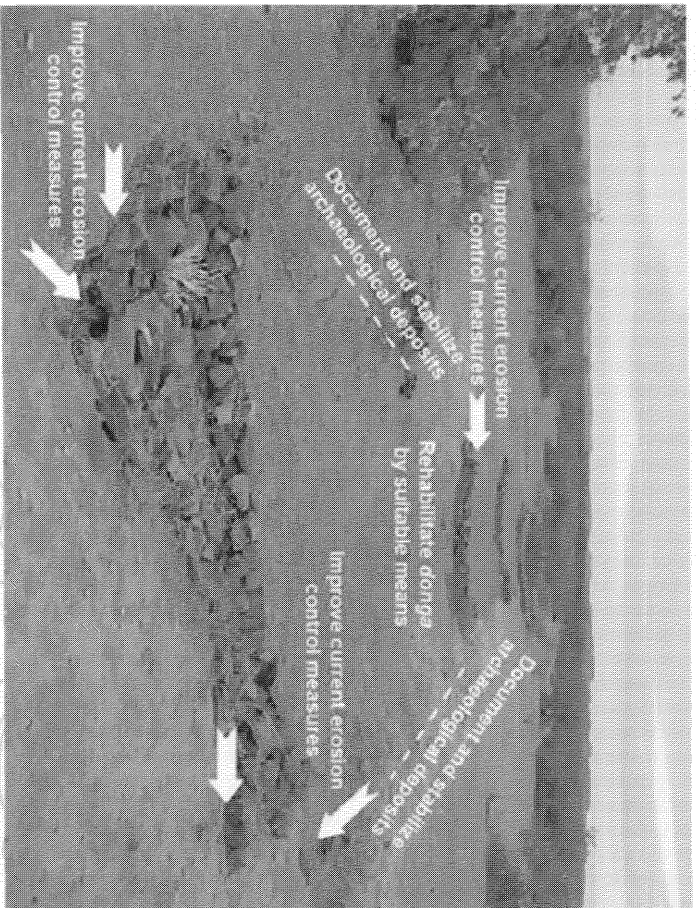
Proposed stabilization of Warthog damage at PON5/1 Site
